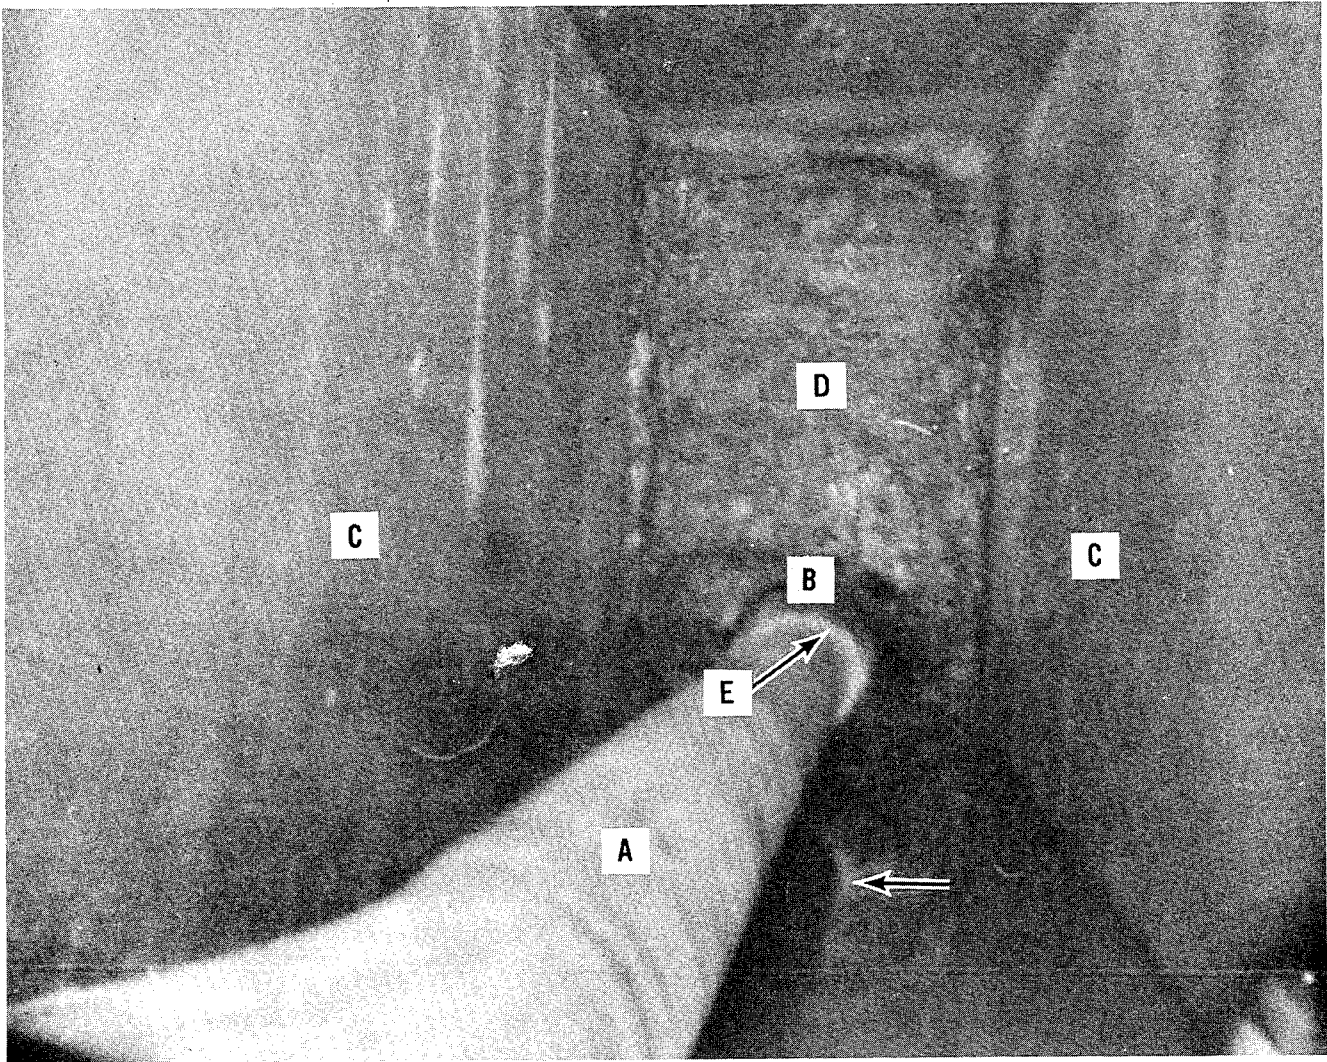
INSIDE CONCRETE ENCASUREMENT LOOKING TOWARD TANK NO. 8.
